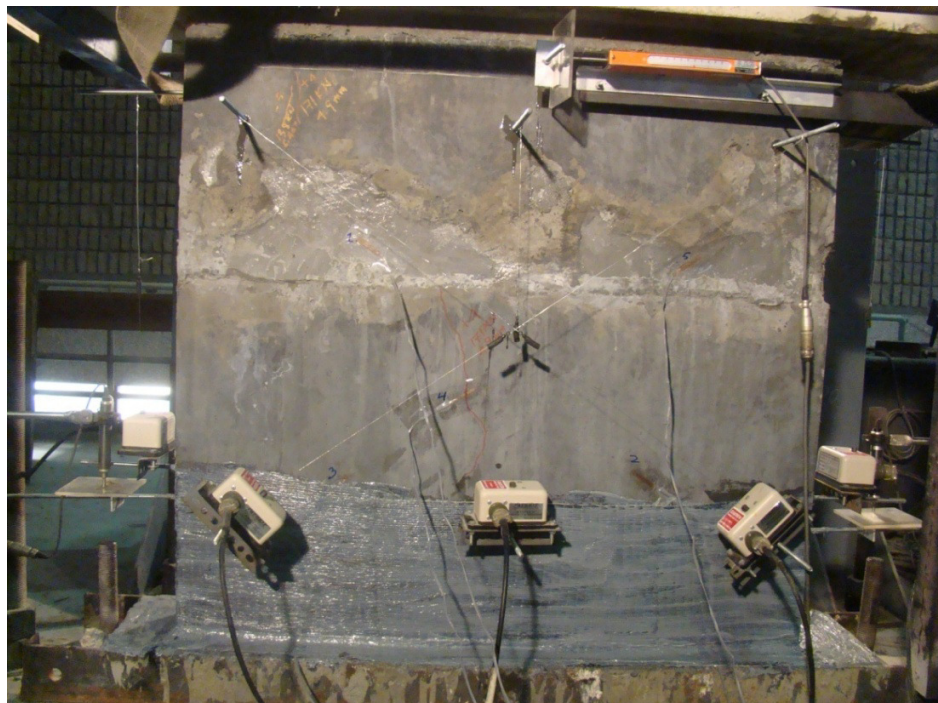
Damage Associated with 7.3 mm Pull Loading, NCMWR Wall
